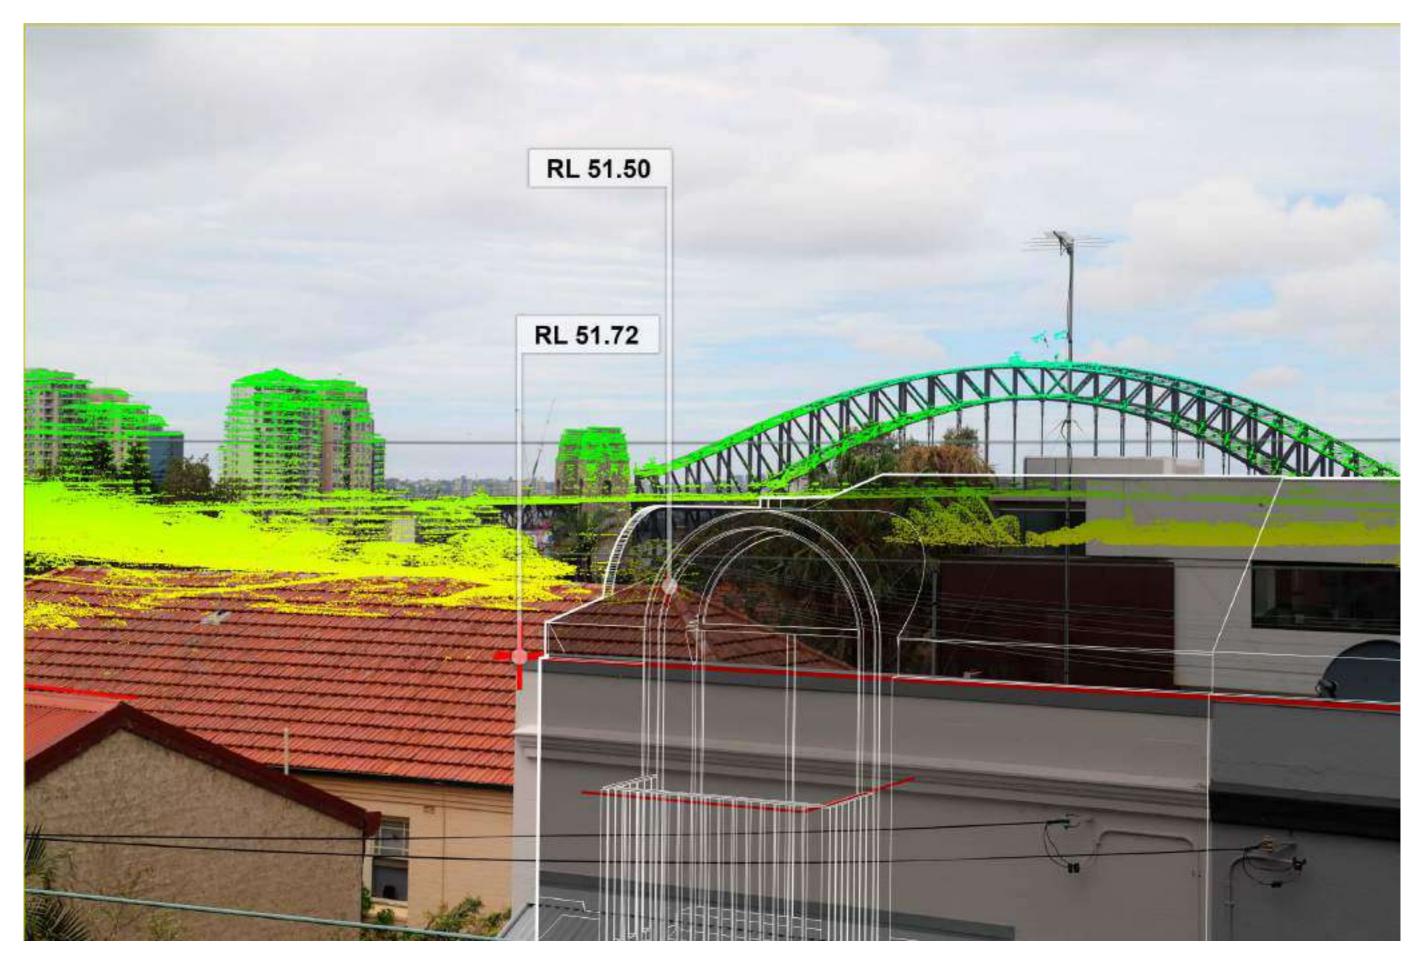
Photomontage showing proposal and alignment wireframes in view southeast from Unit 64 master bedroom balcony – standing
